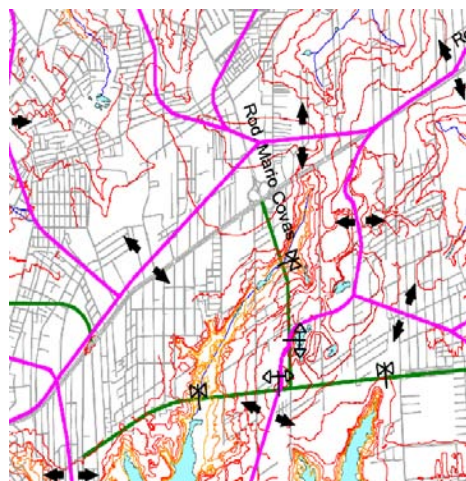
Proposed Drainage Plan for Avenida Mario Covas
